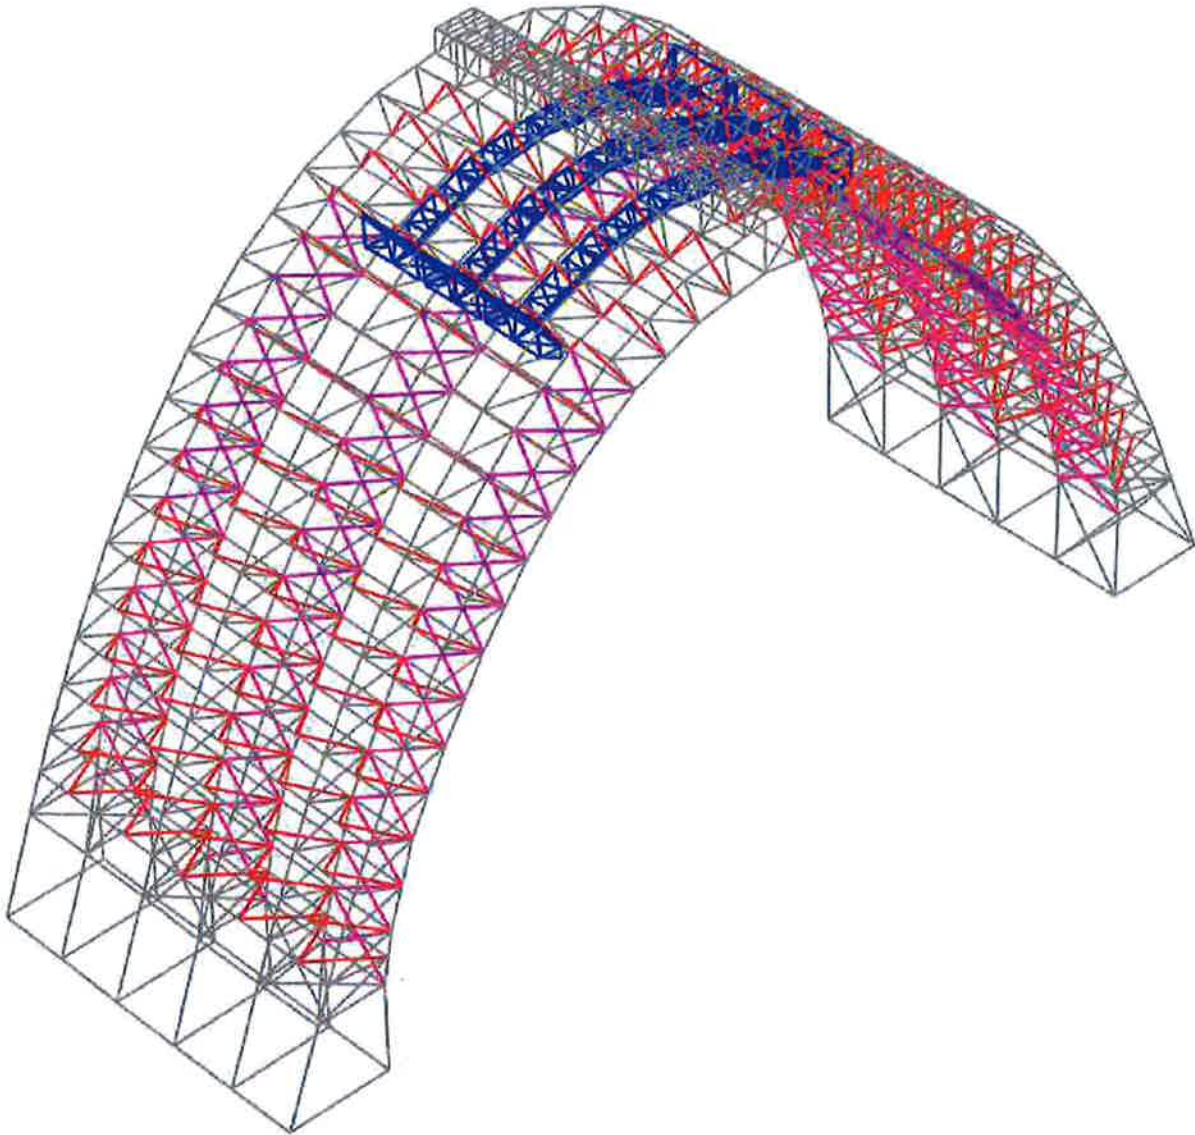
3D Isometric of Exoskeletons Installed between Existing Wood Trusses
